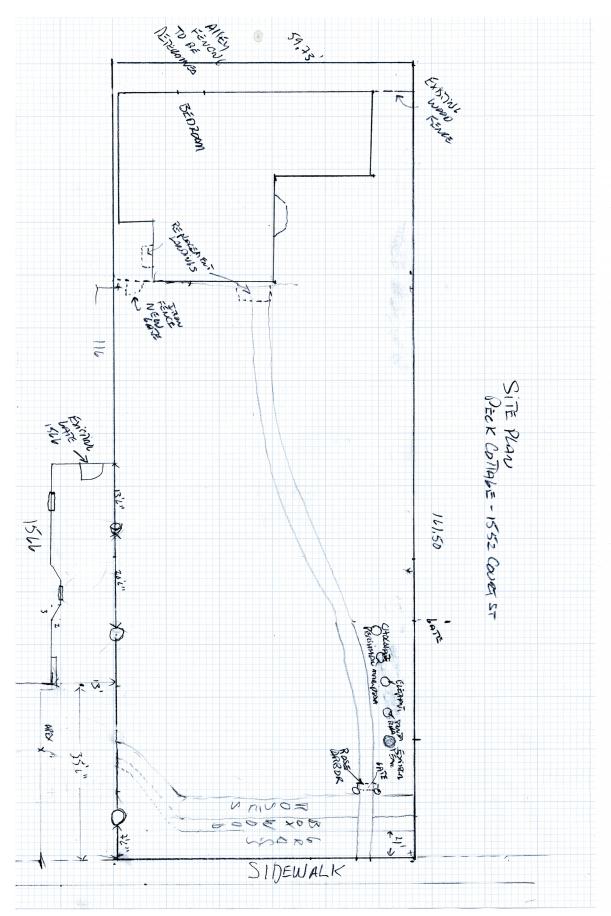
Site Plan For Peck Cottage - 1552 Court Street
